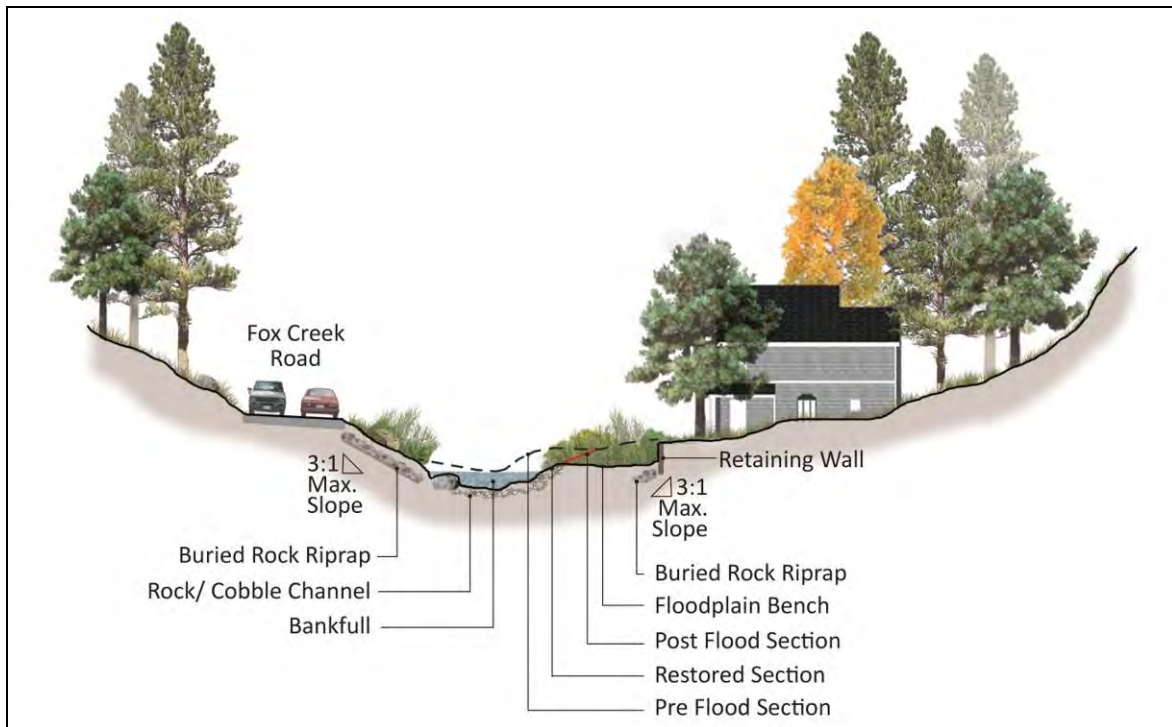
Illustrative section at Fox Creek – view downstream.
